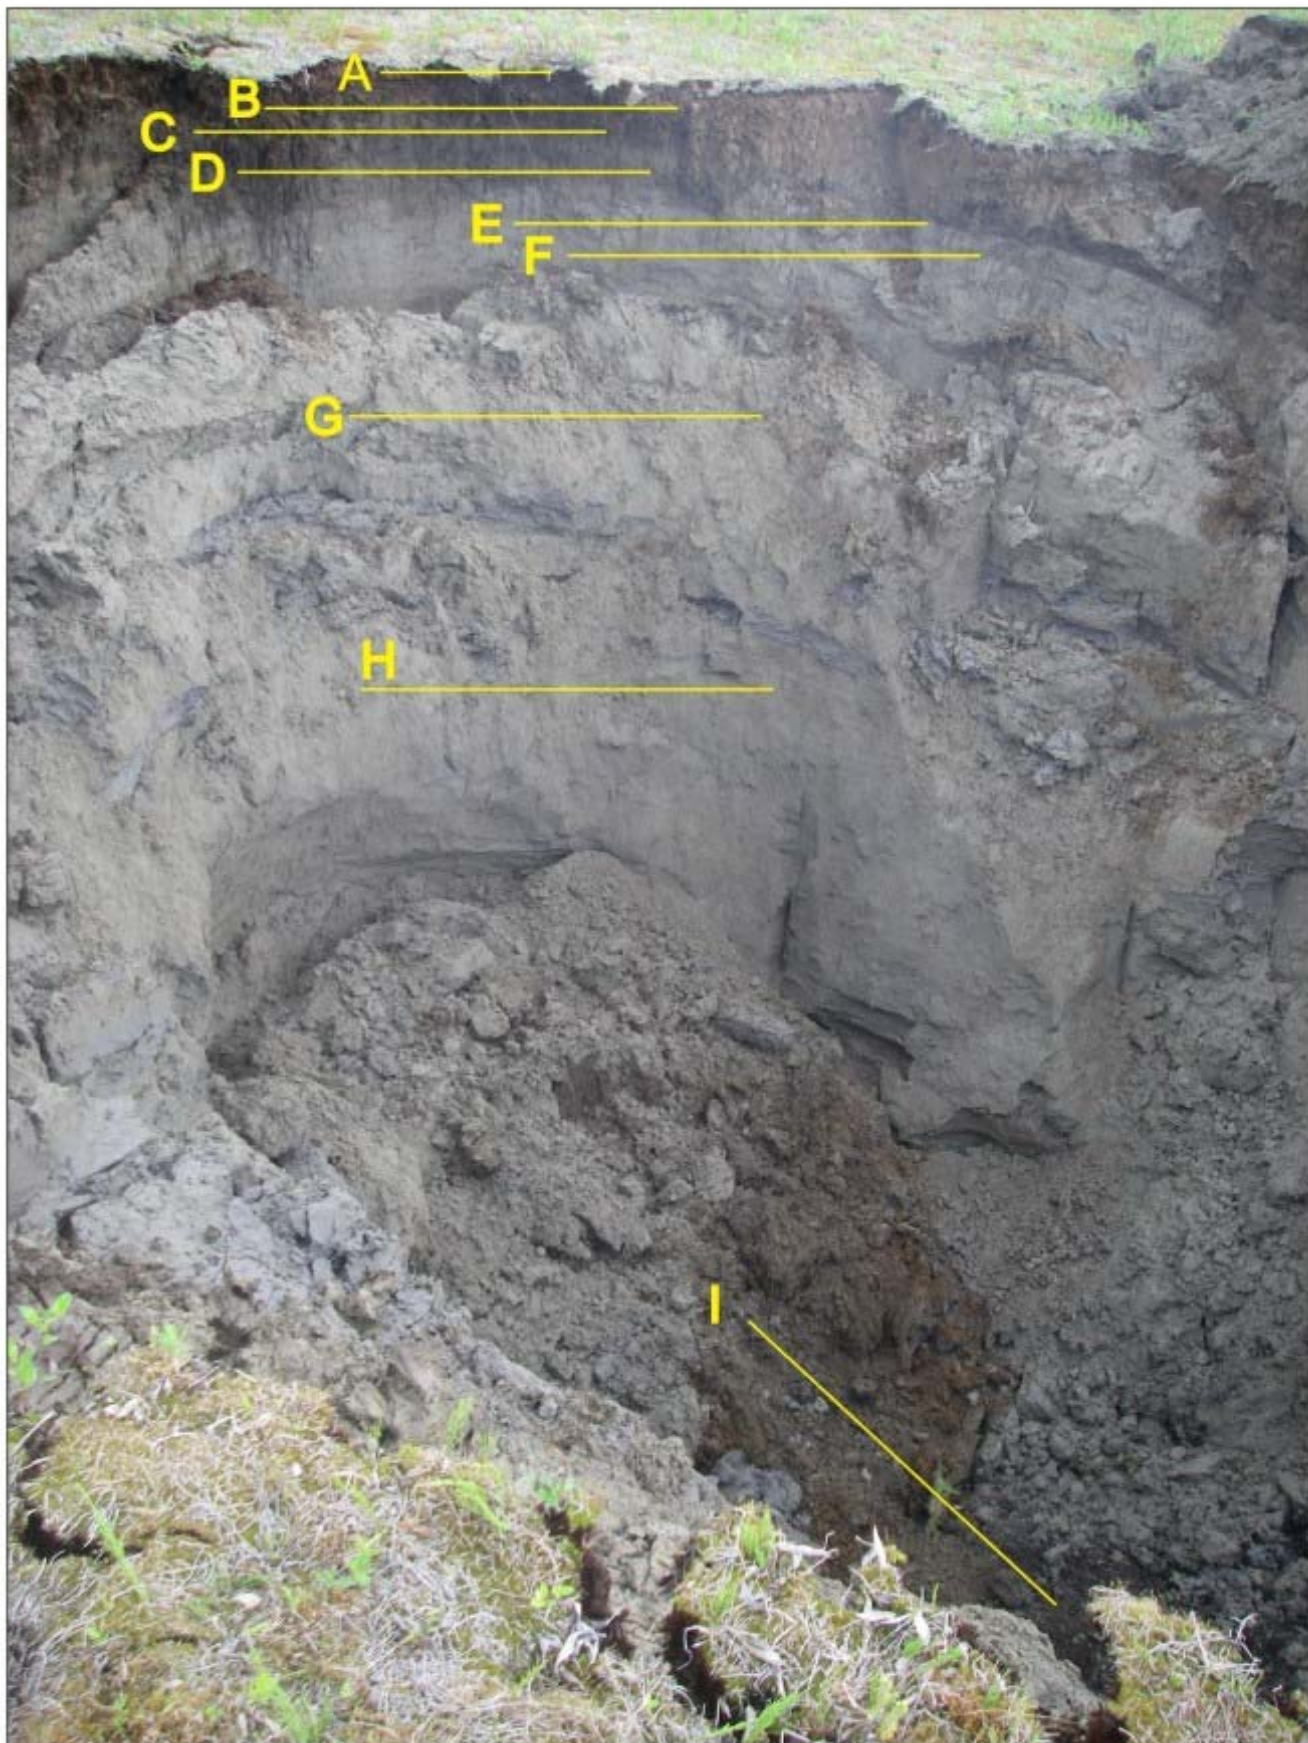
2007 Valley Tailing Test Pitting - Test Pit #1
